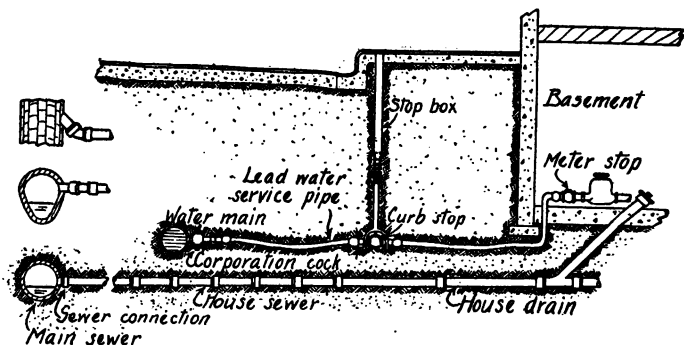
Illustrating provisions of Section 1 (b).
